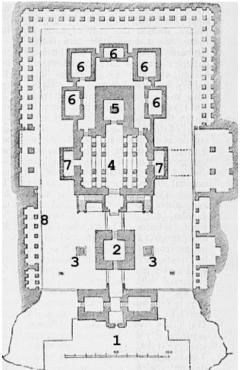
Plan of Kailashnath Temple, Ellora Sujatavanigunasagaran, by. (2002). a study on Hindu temple planning, construction and the vaastu a Study on Hindu Temple Planning, Construction and The Vaastu
